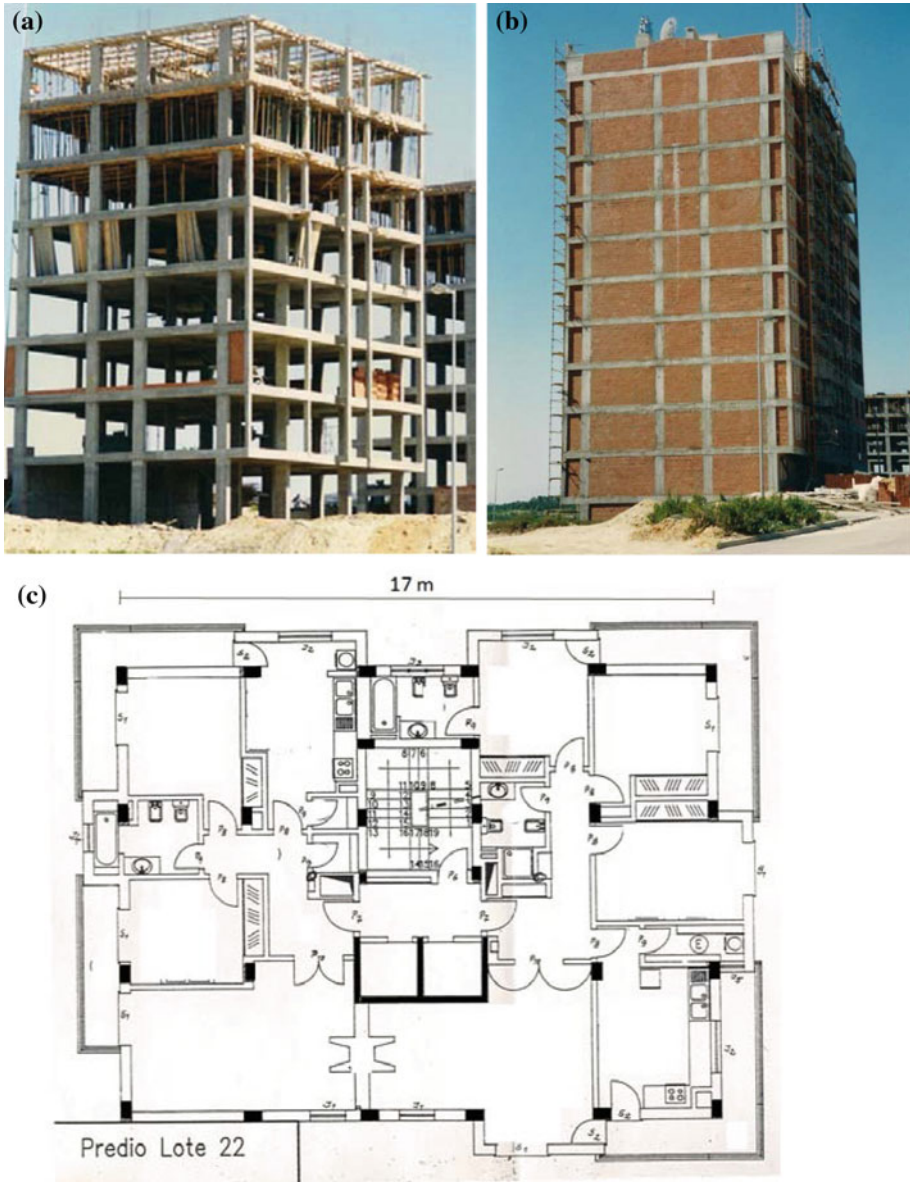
Recent MRF buildings (1990s): a without infill brick walls; b with infill brick walls; c typical plan view
